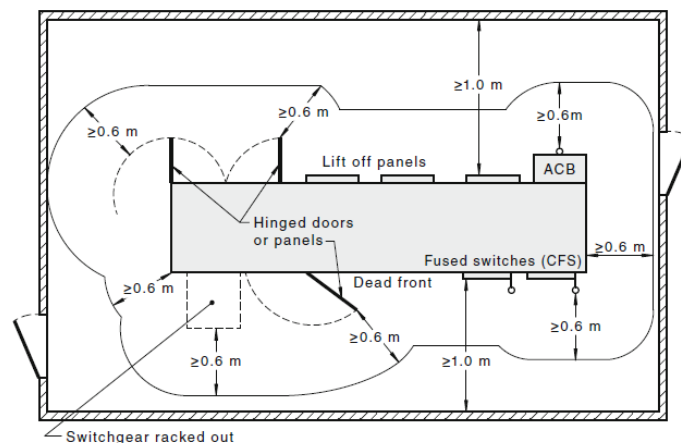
ACCESS TO SWITCHBOARDS—
